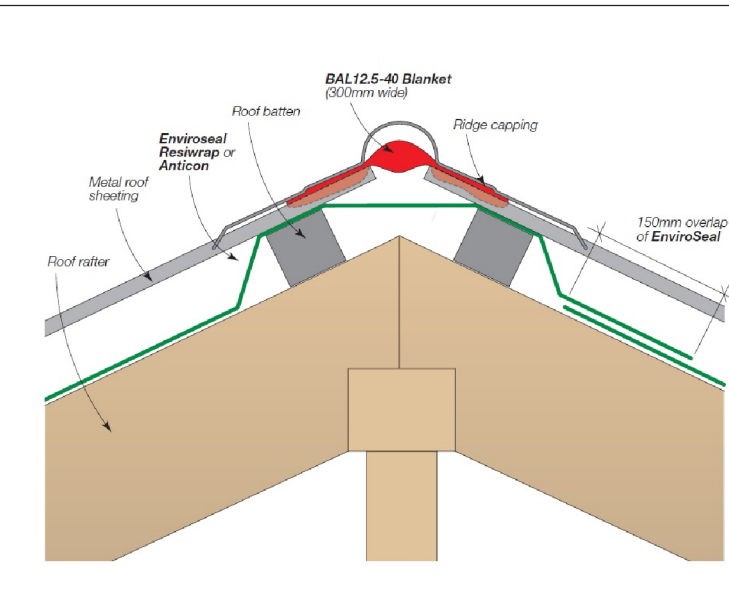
Hip/Ridge Detail – Steel Roof (BAL-12.5 – BAL-40)
